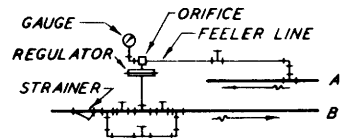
A typical installation of a Pump Governor. Regulating valve is installed in the steam supply line "B" to pump. Feeler pipe is connected in pump outlet line "A" carrying medium being pumped. Adjustable orifice must be used as shown.
